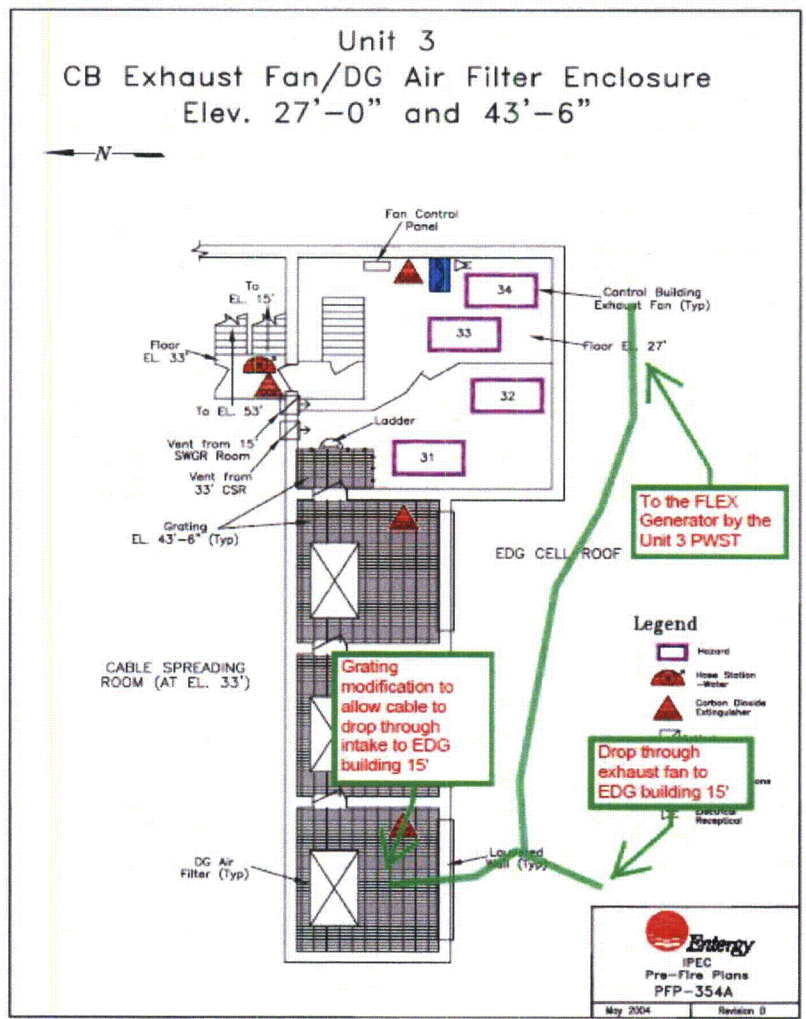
Unit 3 Secondary Routing EDG Building Roof (Reference 9-x)
